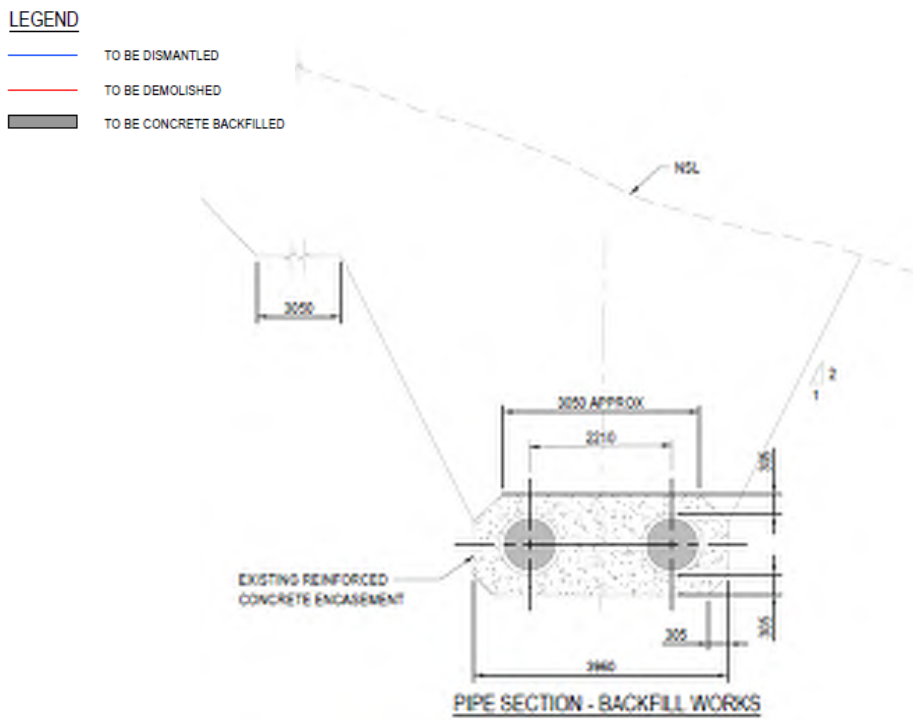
Typical cross section of High Level Outlet Pipes – Option 1D
